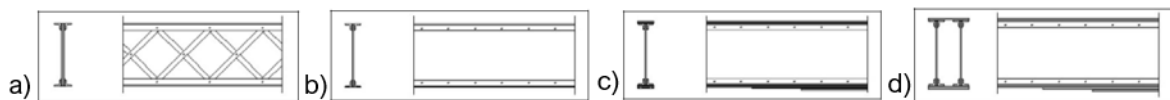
Steel beams typologies in the typical *Eixample's* buildings. a) truss beams with rivetted grid; b) riveted beams with reinforced web; c) riveted beams with reinforced flanges; d) box beams with multiple reinforcements on the bottom flange and double reinforced web (Paricio Casademunt, 2001).
